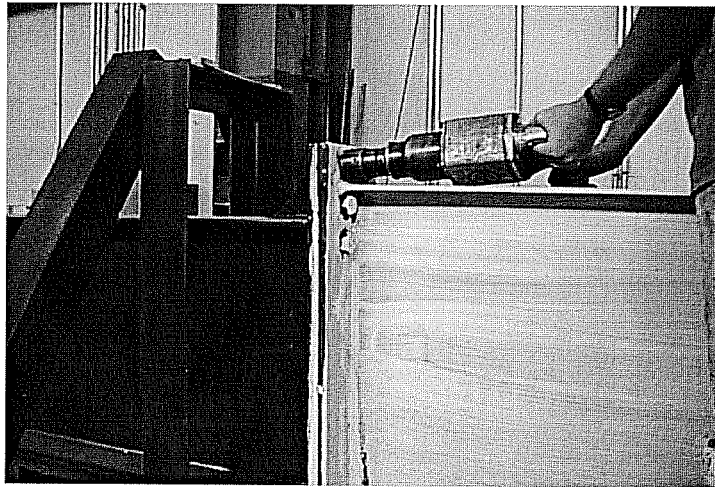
Tightening Of Bolts On Moment Connection Using Impact Wrench
